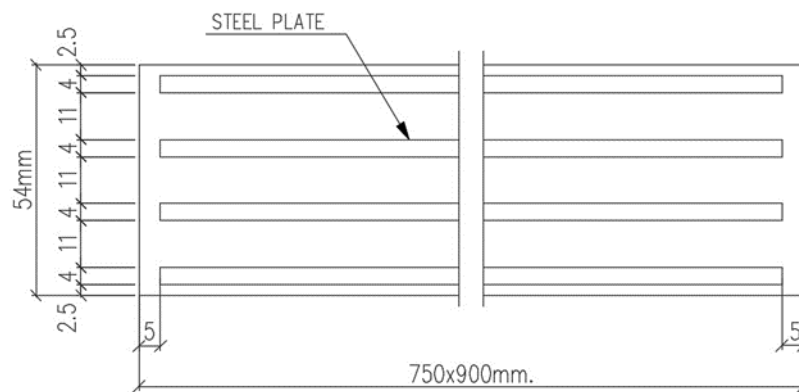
Elastomeric Expansion Bearing used in EBC3 (Cross-Sectional View)
